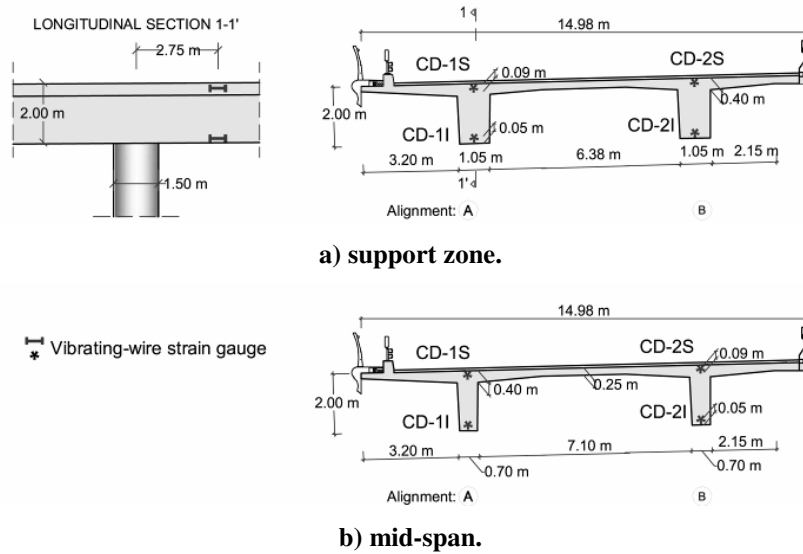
Layout of the vibrating wire strain gauges positioning at cross section (V2N – Zone 1).
